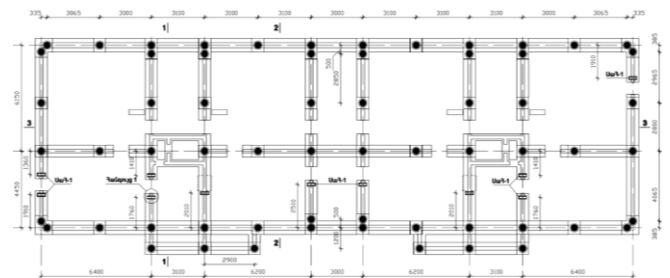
R/C jackets designed for local strengthening of the existing transverse exterior large-panel load-bearing walls of the first floor of 9-story apartment building
